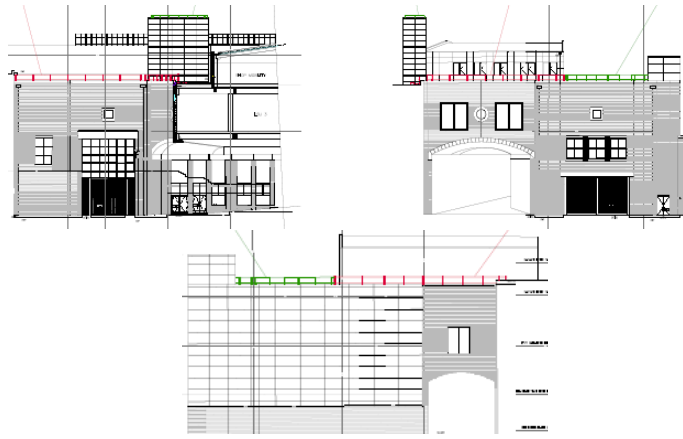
Proposed north, south and east elevations of The Oracle Buildings to the north of the Kennet visible from Yield Hall Place (proposed additions shown in red)
